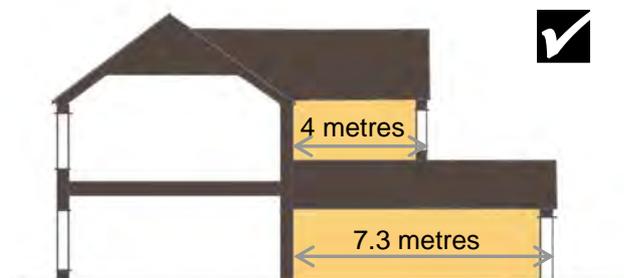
A rear extension should be no more than 7.3m deep for a ground floor extension and 4m deep for a first floor extension (note all dimensions are external)
